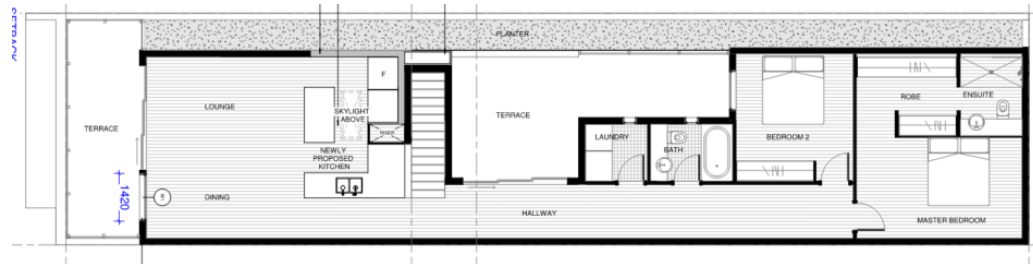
Approved level 2 plan under DA/660/2003/C - 7/274 Arden Street, Coogee (Source: Place Studio)
